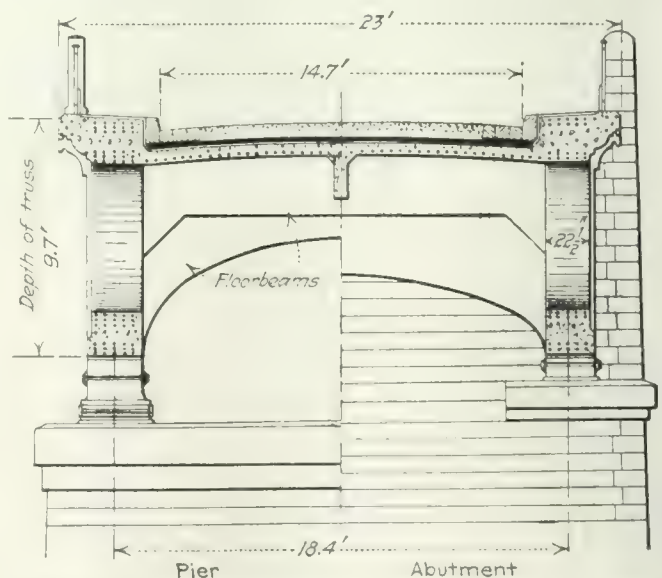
CROSS-SECTION OF CONCRETE TRUSS BRIDGE
